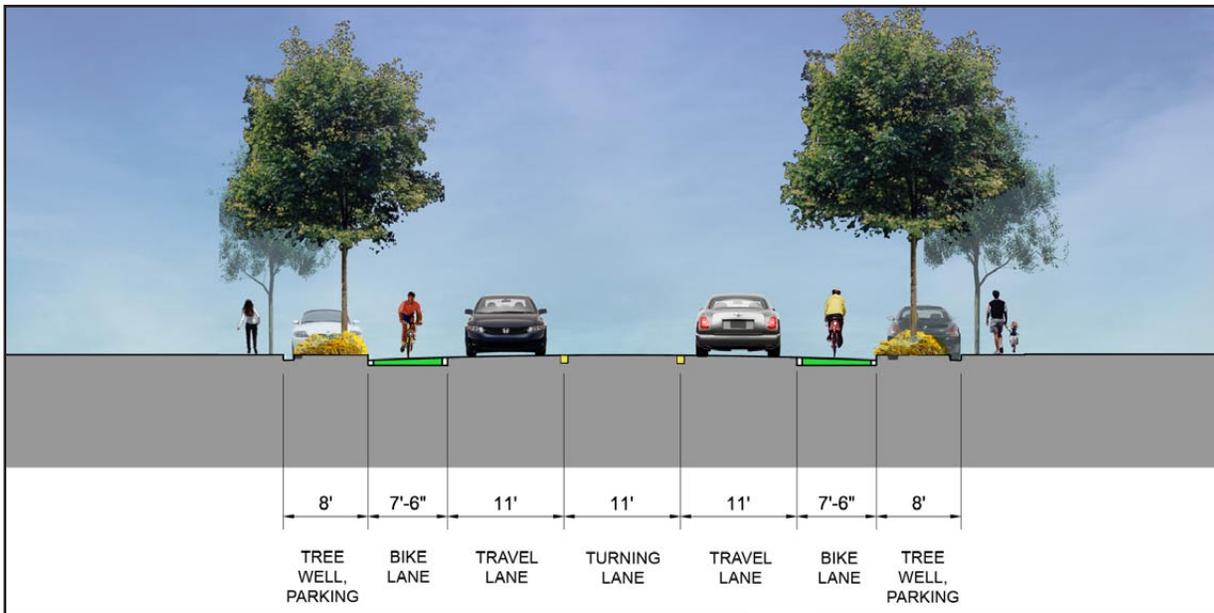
East Rush Street, from Tyler Avenue to Peck Road, facing south — Proposed.
